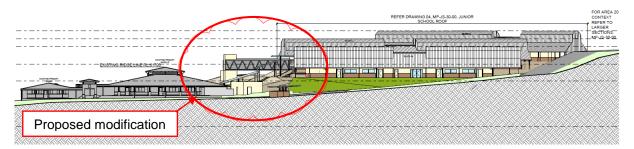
| Proposed eastern site elevation (Source: Applicant's Modification Application 2020)
